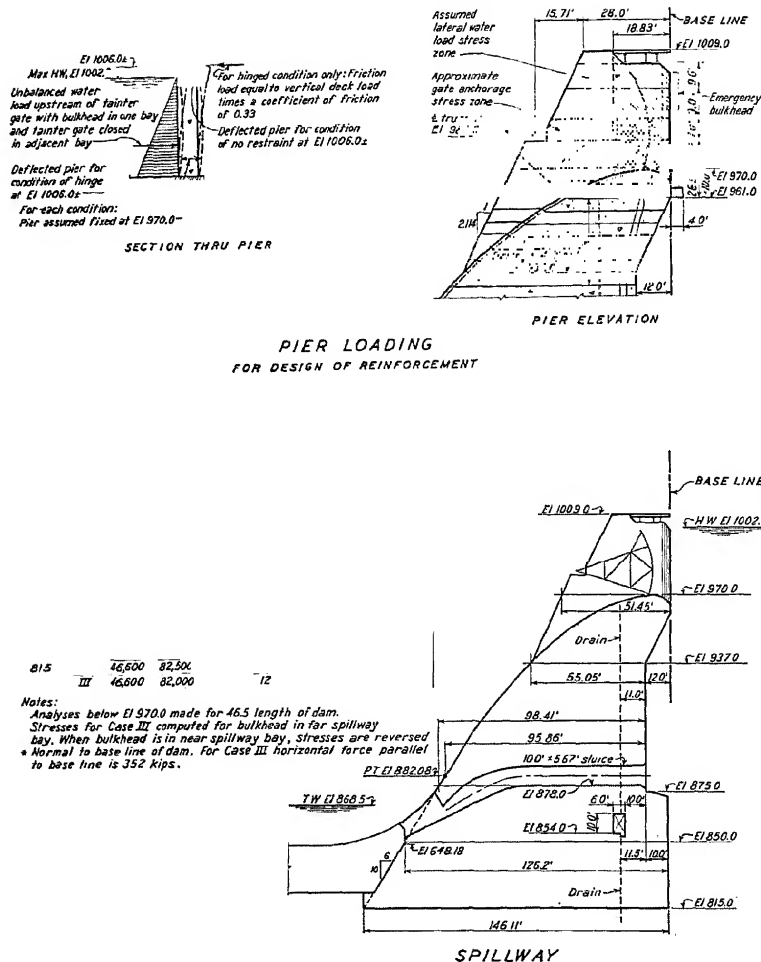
Spillway dam—Stability analysis and pier loading.
